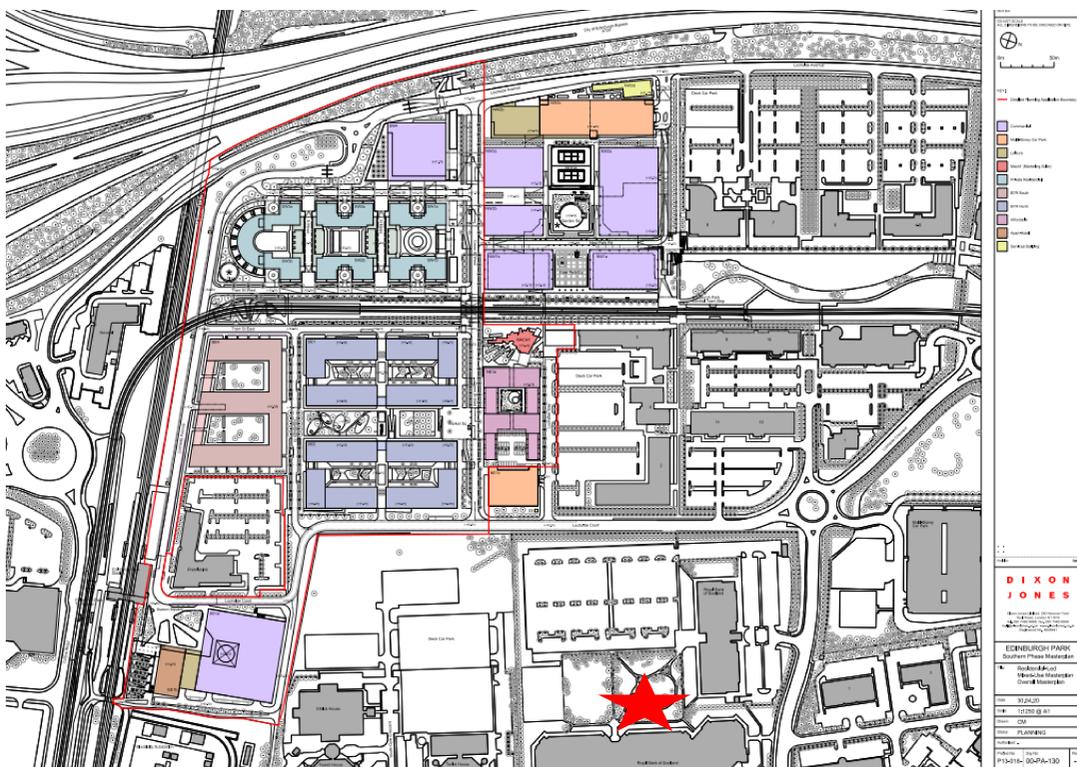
Proposed Masterplan— Overall Plan : Source : Planning Application 20/02068/FUL Dixon Jones Architects—City of Edinburgh Council Planning Portal
